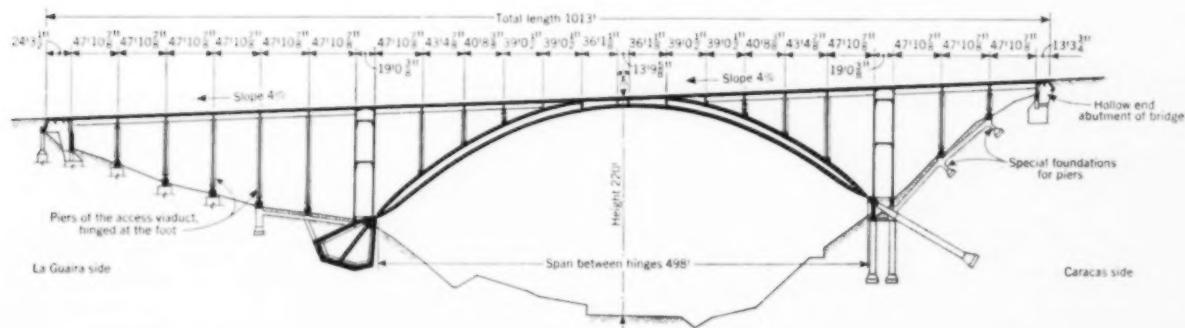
Elevation of bridge No. 1 shows principal dimensions and foundations for arch.
